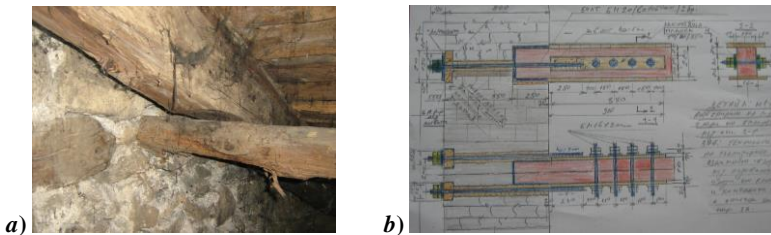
,b. Anchoring of purlin to the outside wall by steel lashes
